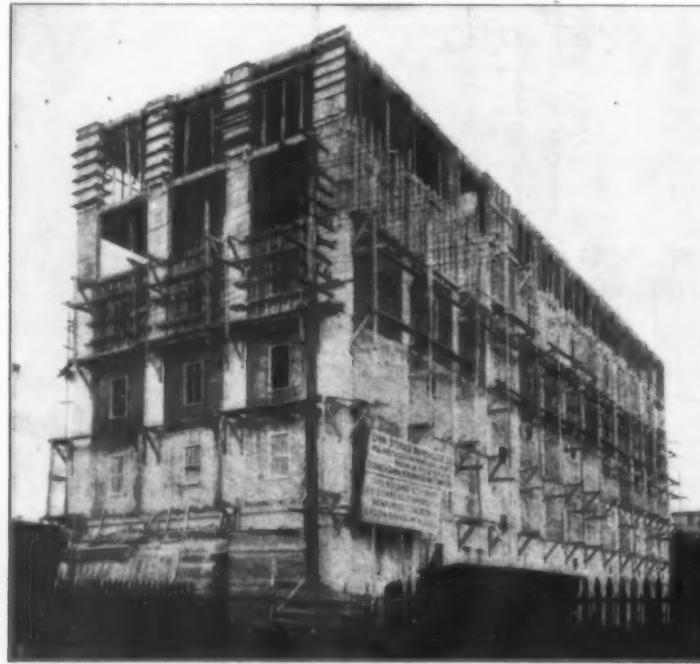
PANEL FORM CONSTRUCTION IN STORAGE WAREHOUSE, LYNN, MASS.
